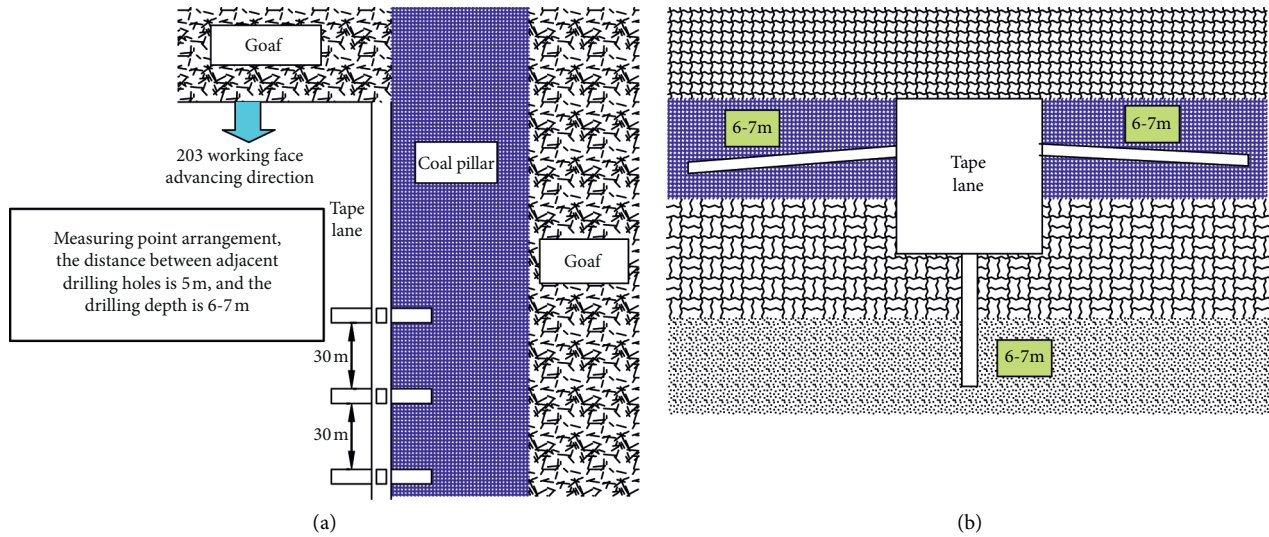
Plane section of borehole survey: (a) floor plan and (b) section.
